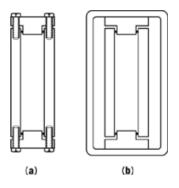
(a) Closed-end condition; (b) open-end condition (4).
